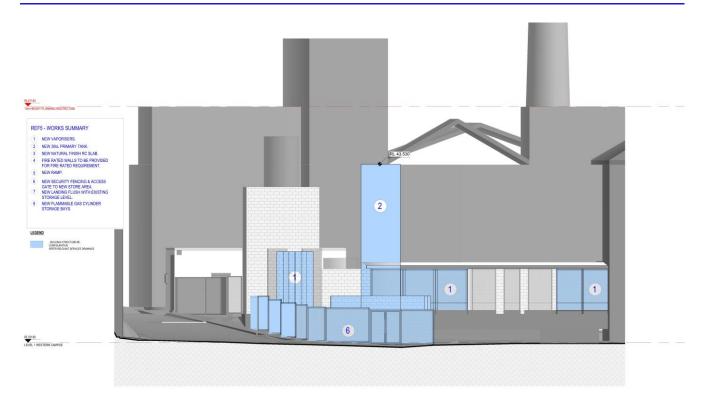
Proposed Elevation 1 (Refer to Elevation 2-1 in Figure 7)
